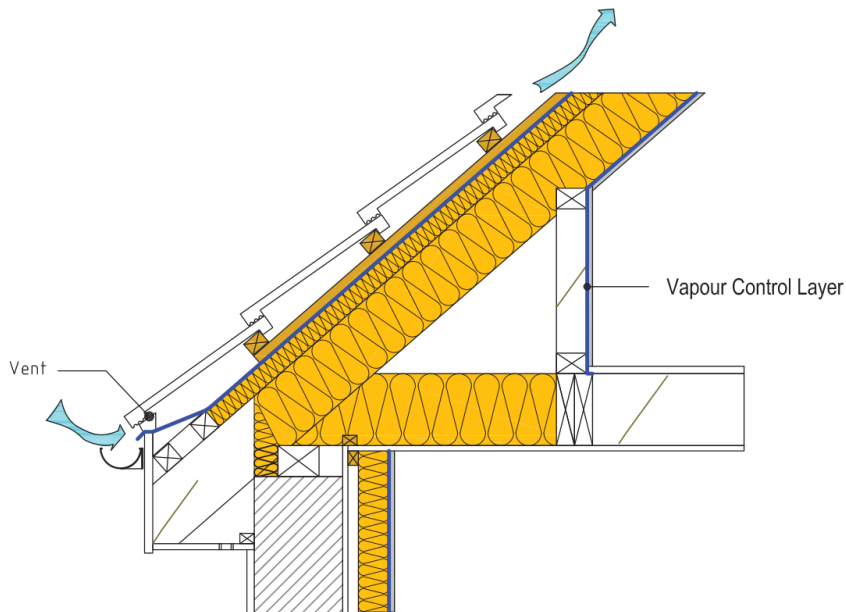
Roof and internal wall insulation junction (Reproduced from S.R. 54:2014 with the permission of NSAI)
